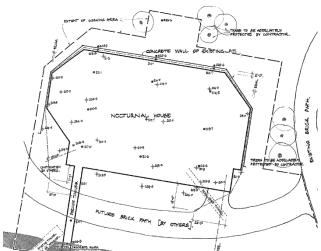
c1970. Nocturnal House original plans showing new wall to southern extent of item (to be partly demolished under this application).
